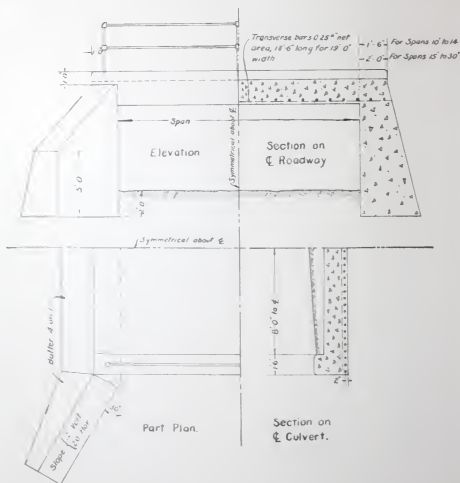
Standard culvert with rod reinforcement of 10 and 20-foot span. Designed by the Department of Highways of the State of New York.
